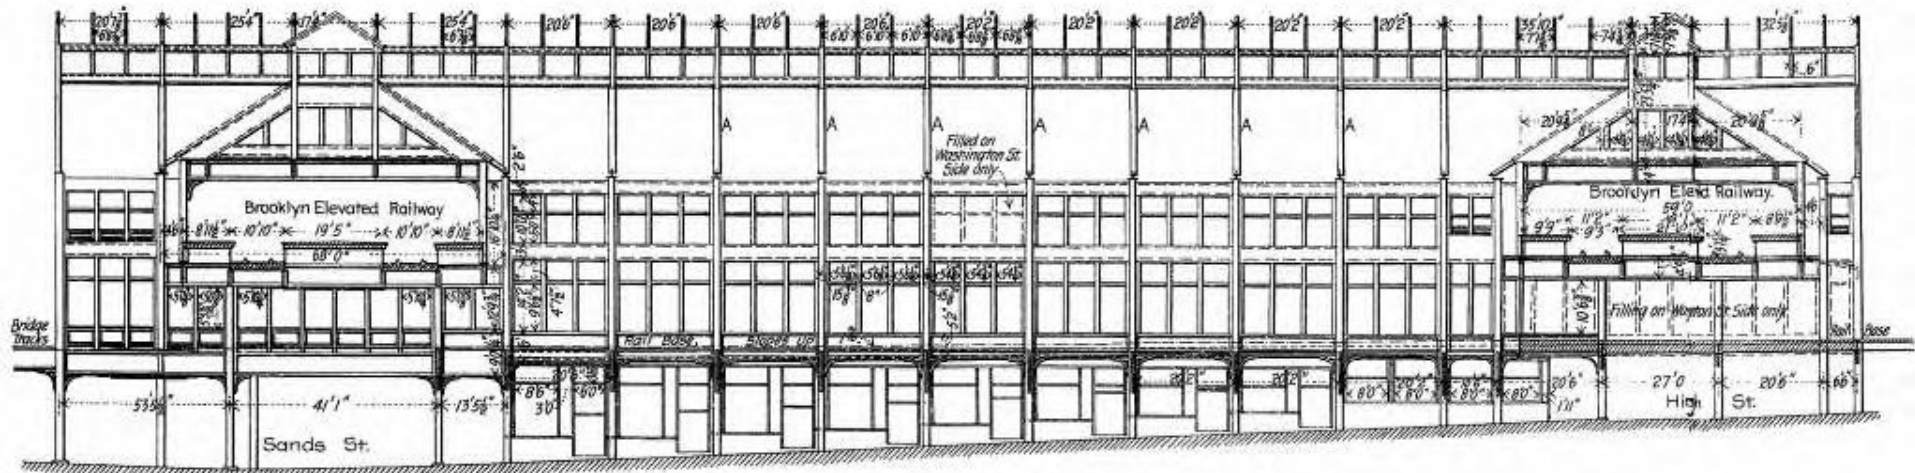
ELEVATION OF FRAMING OF STATION ON FULTON ST. SIDE.
